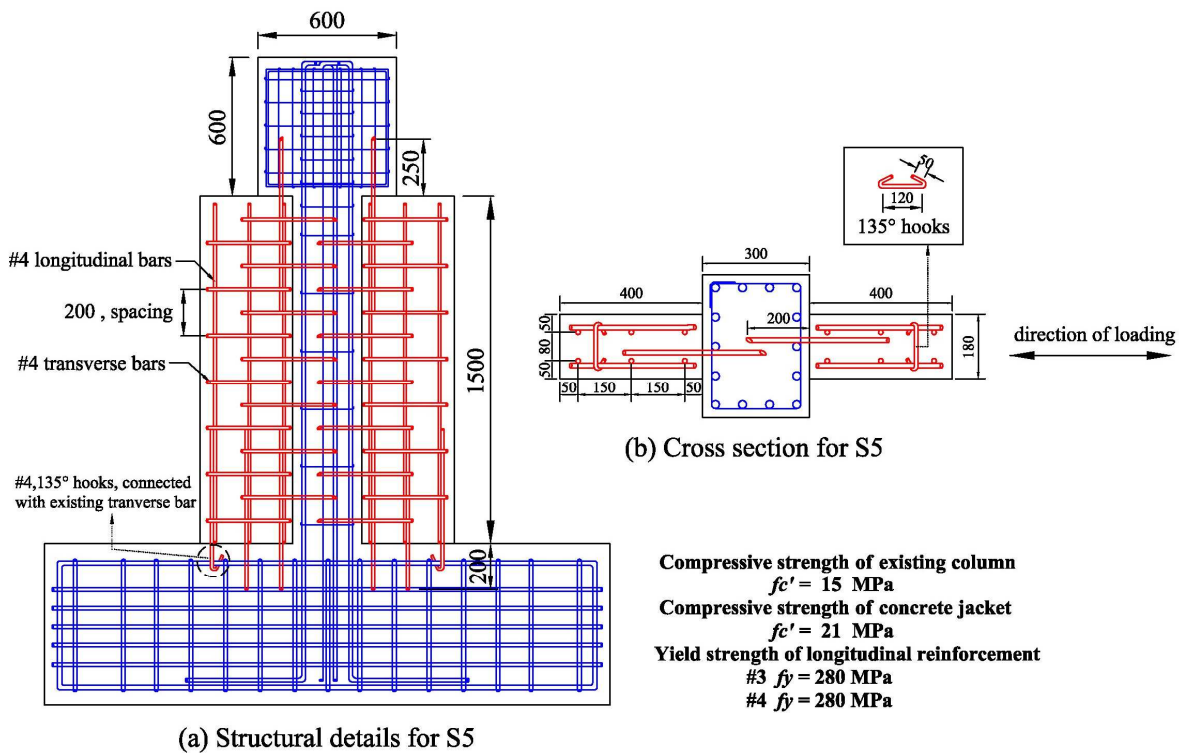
The specimen configuration and details of the substandard column retrofitted by wing walls using Japan structural details (unit: mm)
